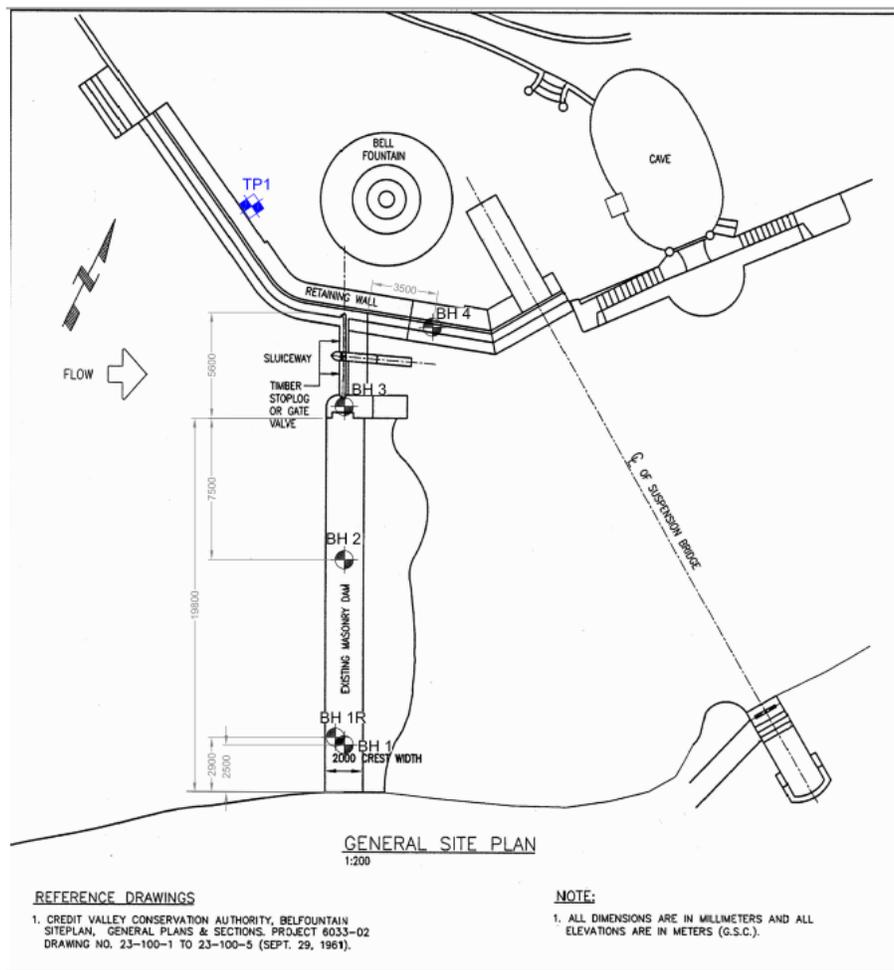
Belfountain Conservation Area Plan View (Extracted from Terraprobe, 2013)
